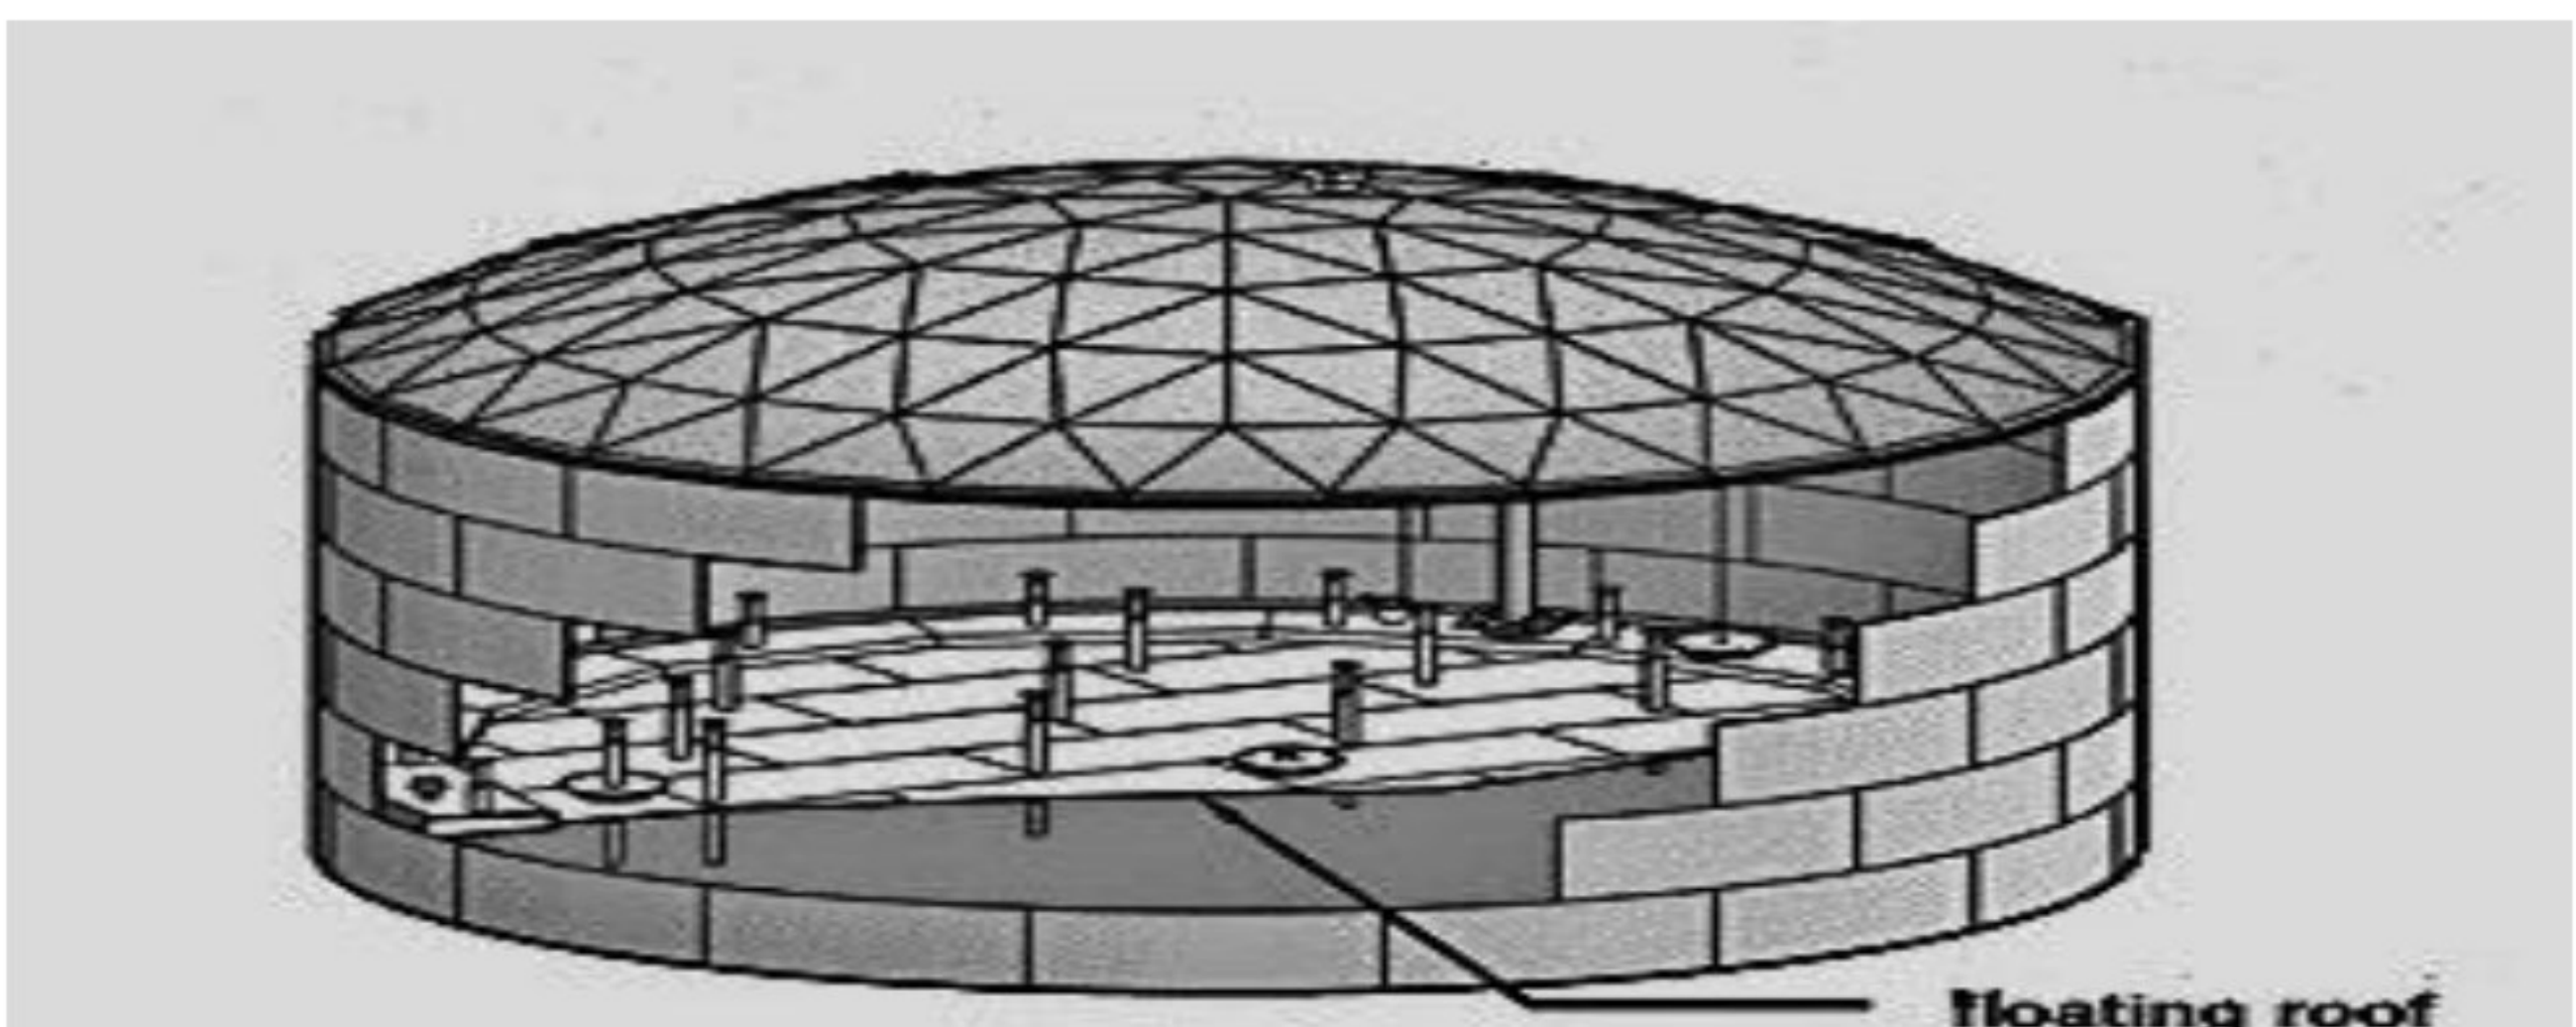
Vertical cylindrical tanks with semi-circular ceilings and floating roof
